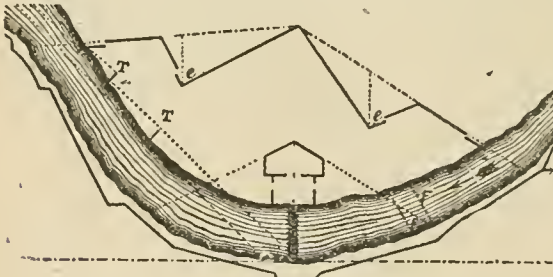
Tenaille Intrenchments protecting Bridge.
